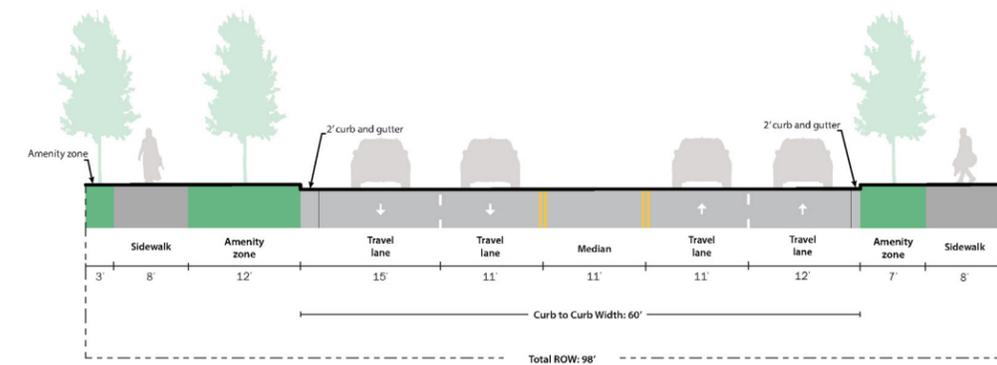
Section G (72nd Avenue West of Newton Street – Looking East)
